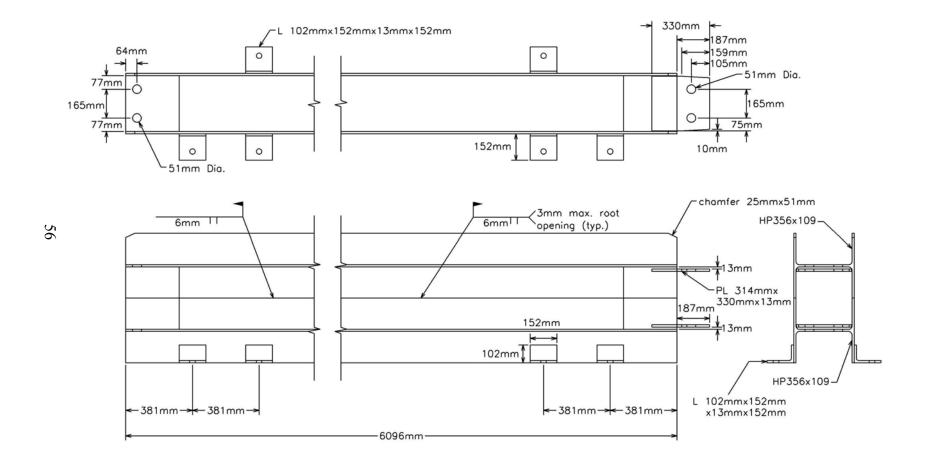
Steel H-section Temporary Barrier Design Details (Design No. 2)
